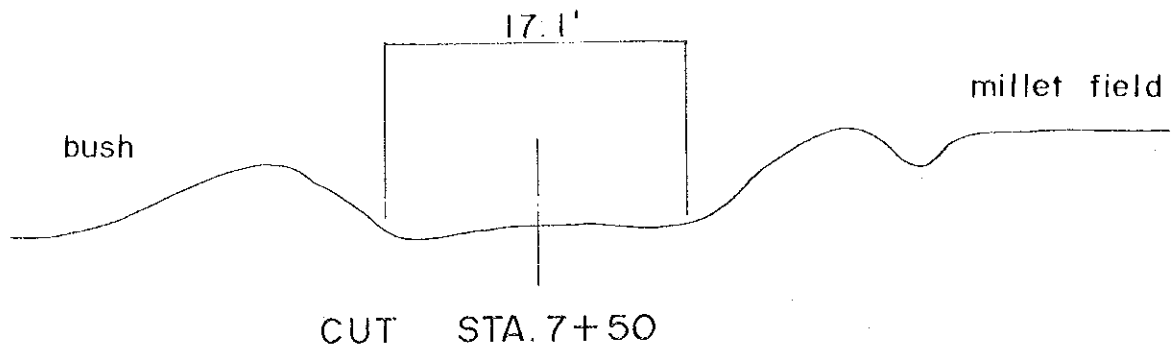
8 EXISTING TYPICAL CROSS SECTION (ft.)
